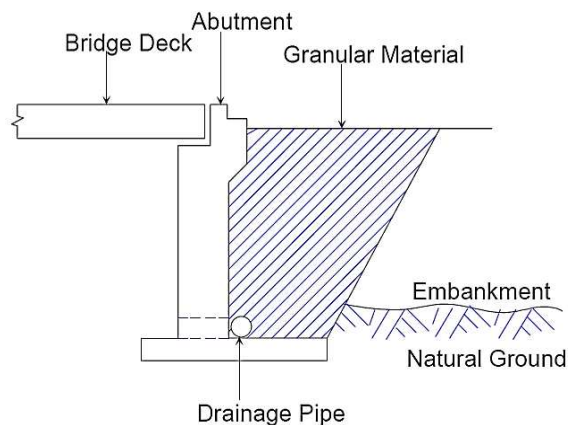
Internal drainage system behind the abutment (Abu-Hejlah et al., 2006)
